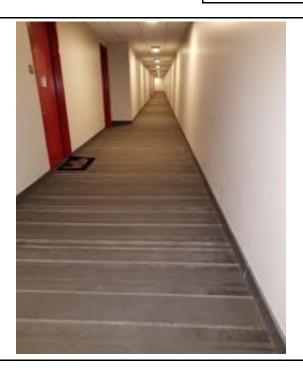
First floor concrete slab covered in carpet, facing north. 27 February 2019.
